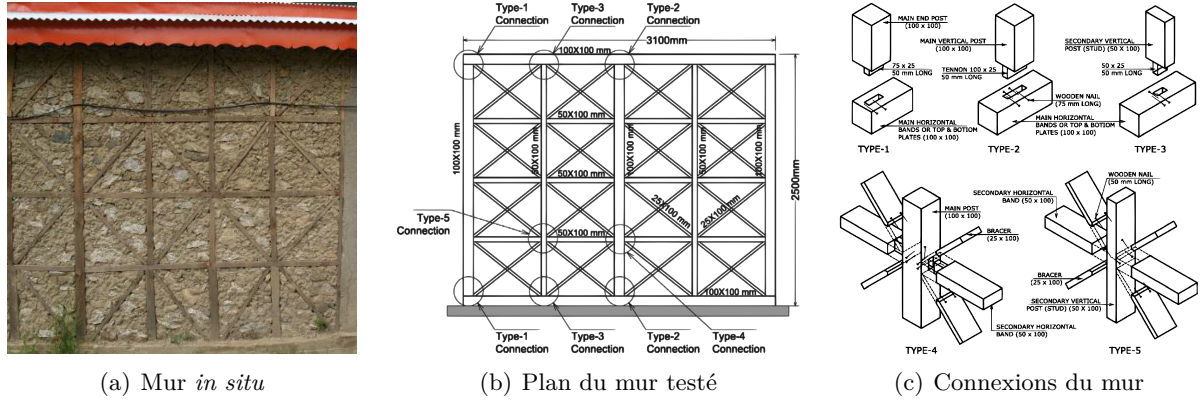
Dhajji-dewari* wall, Ali *et al.* [5]
